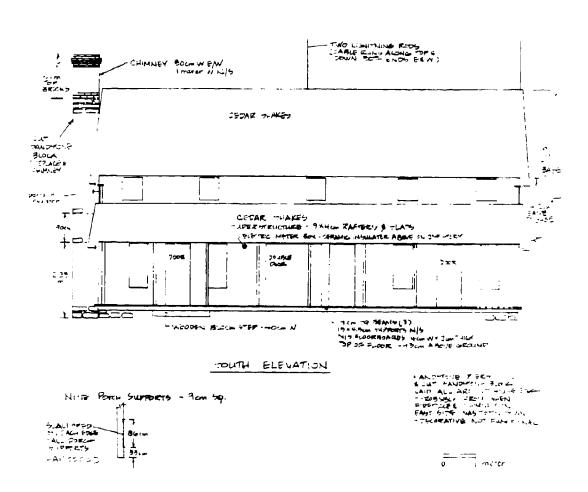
Field architectural drawings of the south elevation of the main dwelling at 41DN157.
